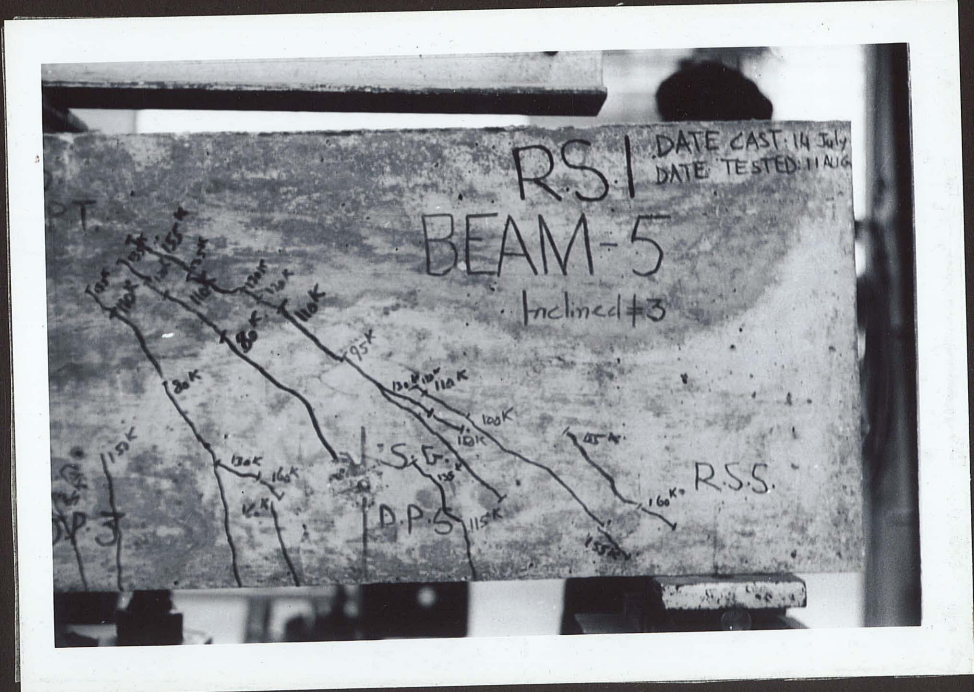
Beam 5: Close View of Side R.S.1 at Failure
